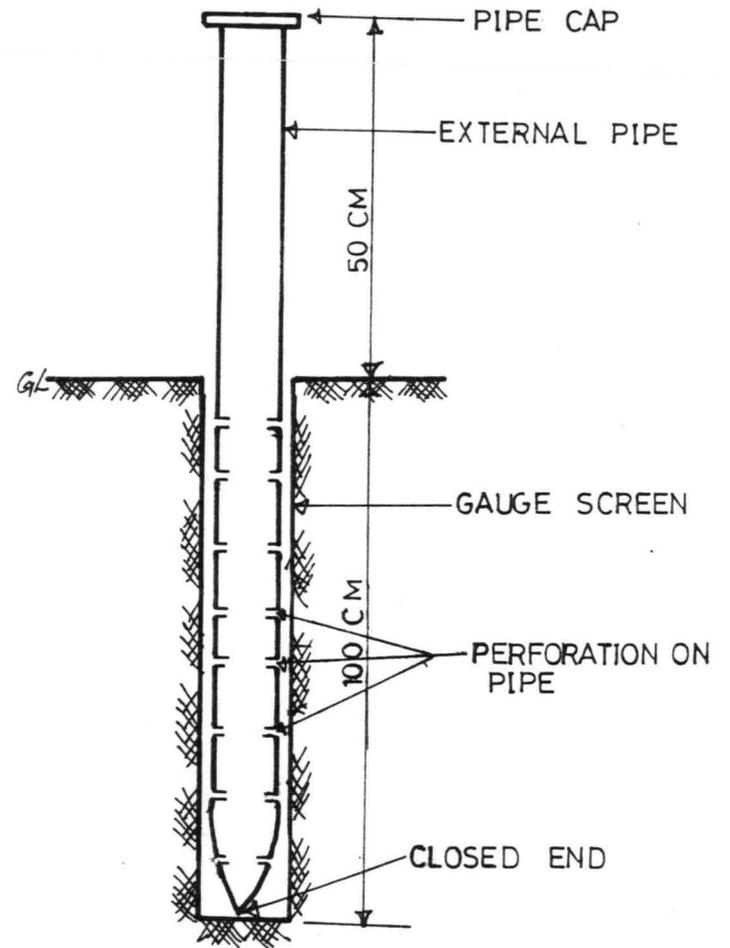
07 CROSS SECTION OF CONSTRUCTED PIEZOMETER PIPE
